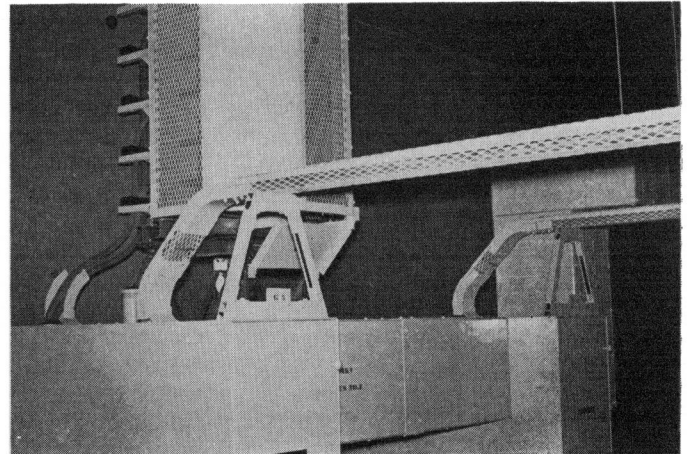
Expanded metal crossover trough supporting cables between 4-kv busses 1 and 2, Station G, San Francisco
